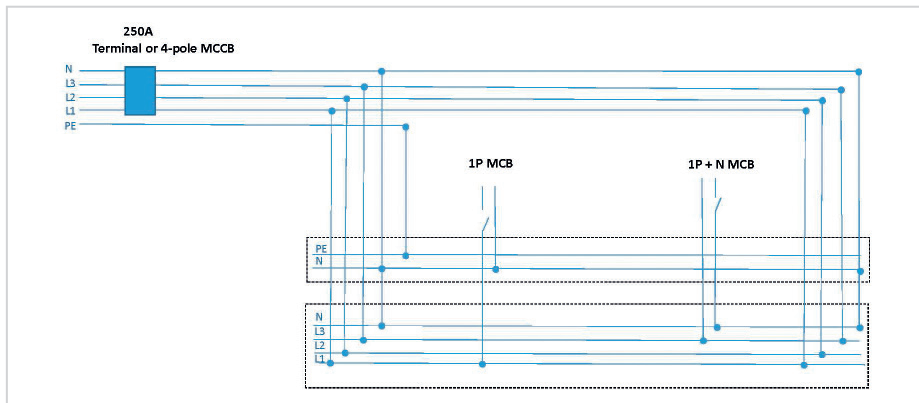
Electrical drawing between 4-pole MCCB and incoming terminal block ZLS224
